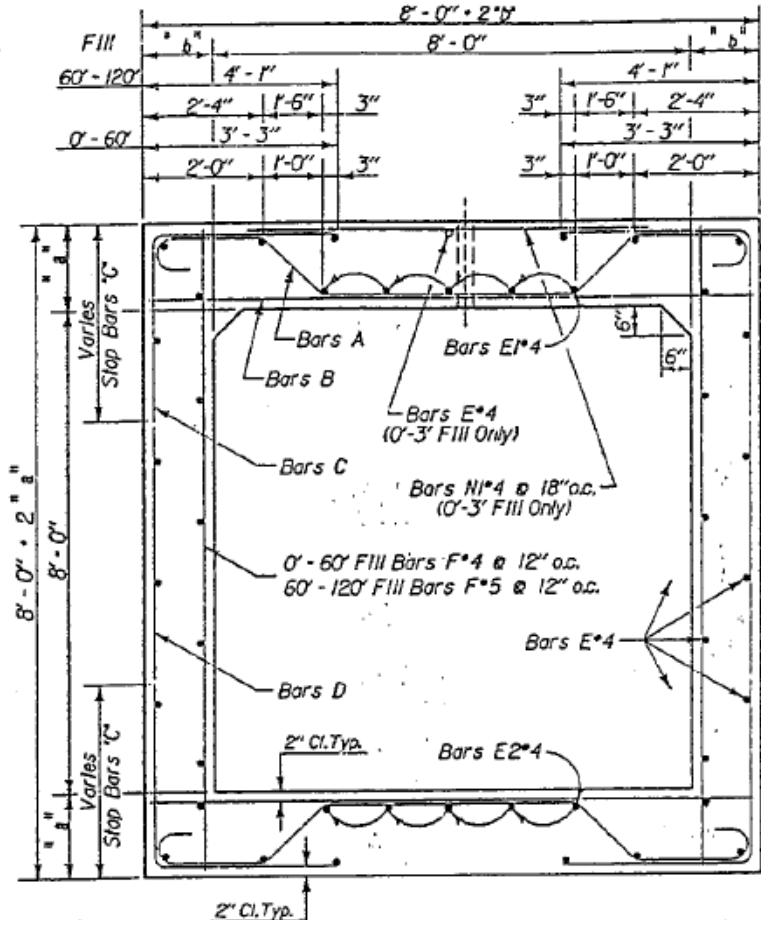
Dutton Culvert at 548+23 Cross Section (ALDOT 1988)
